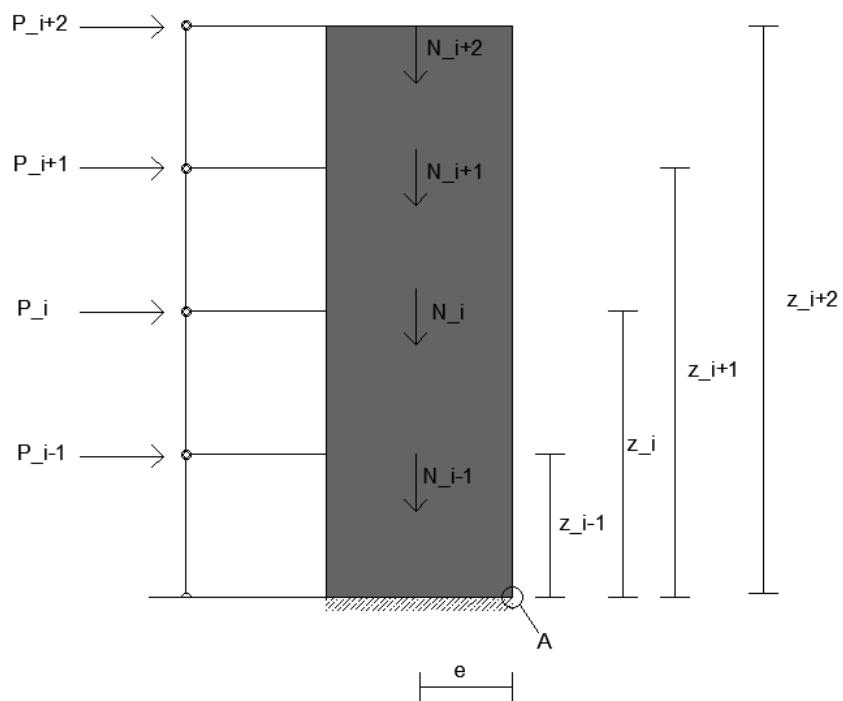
Figure of horizontal loads P and vertical loads N acting on shear wall when considering overturning moment.
